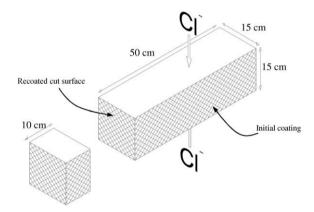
Initial concrete prism specimens + cuts for laboratory tests.
